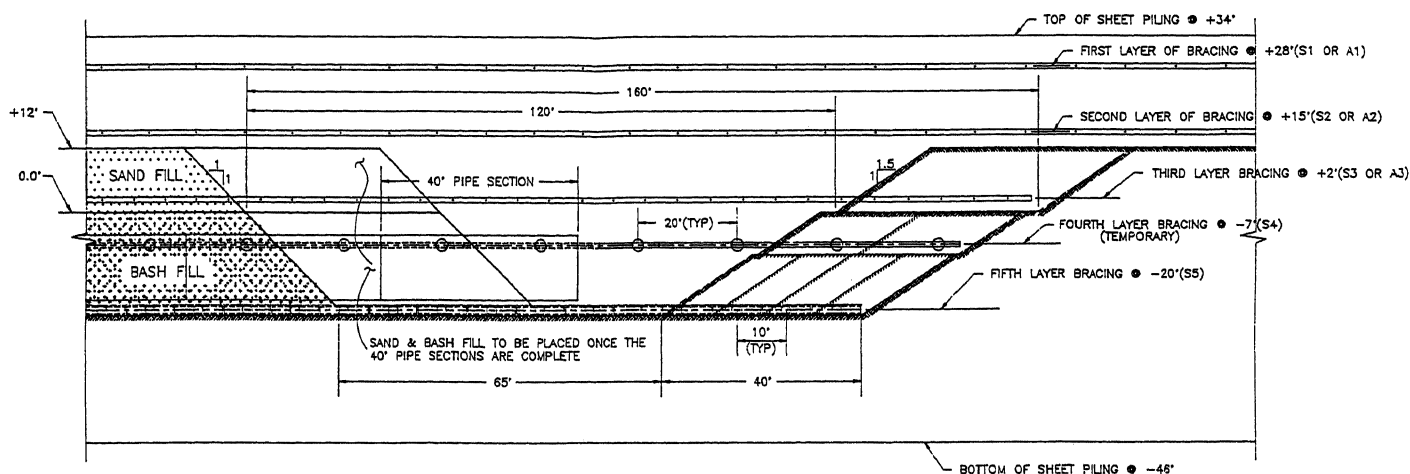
Typical Construction Sequence for each 40-ft. Section of Pipe Installation
